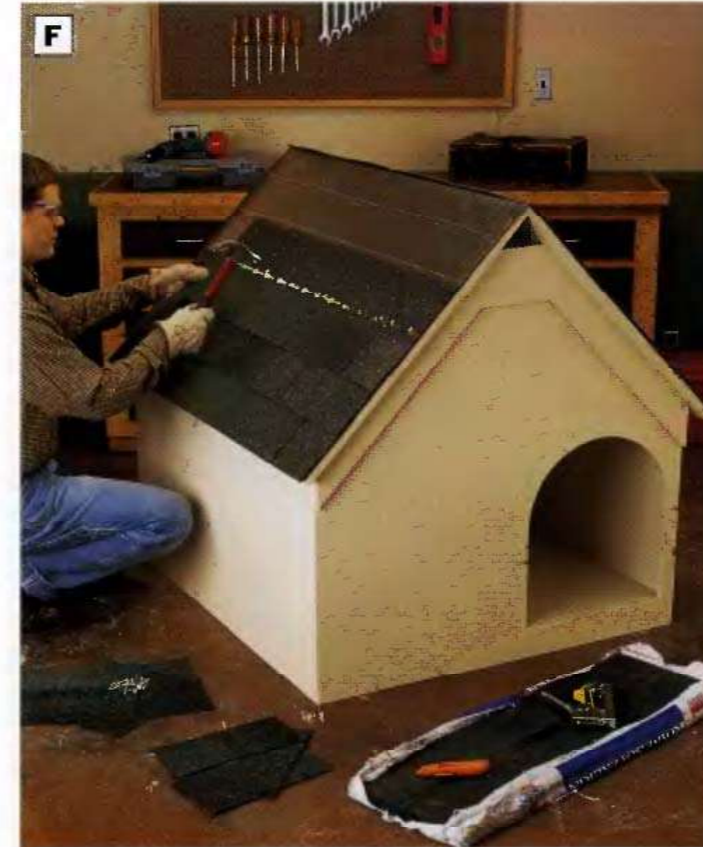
PHOTO F: Staple a layer of building paper over the roof panels, then shingle the roof, starting from the bottom and working up to the peak.
